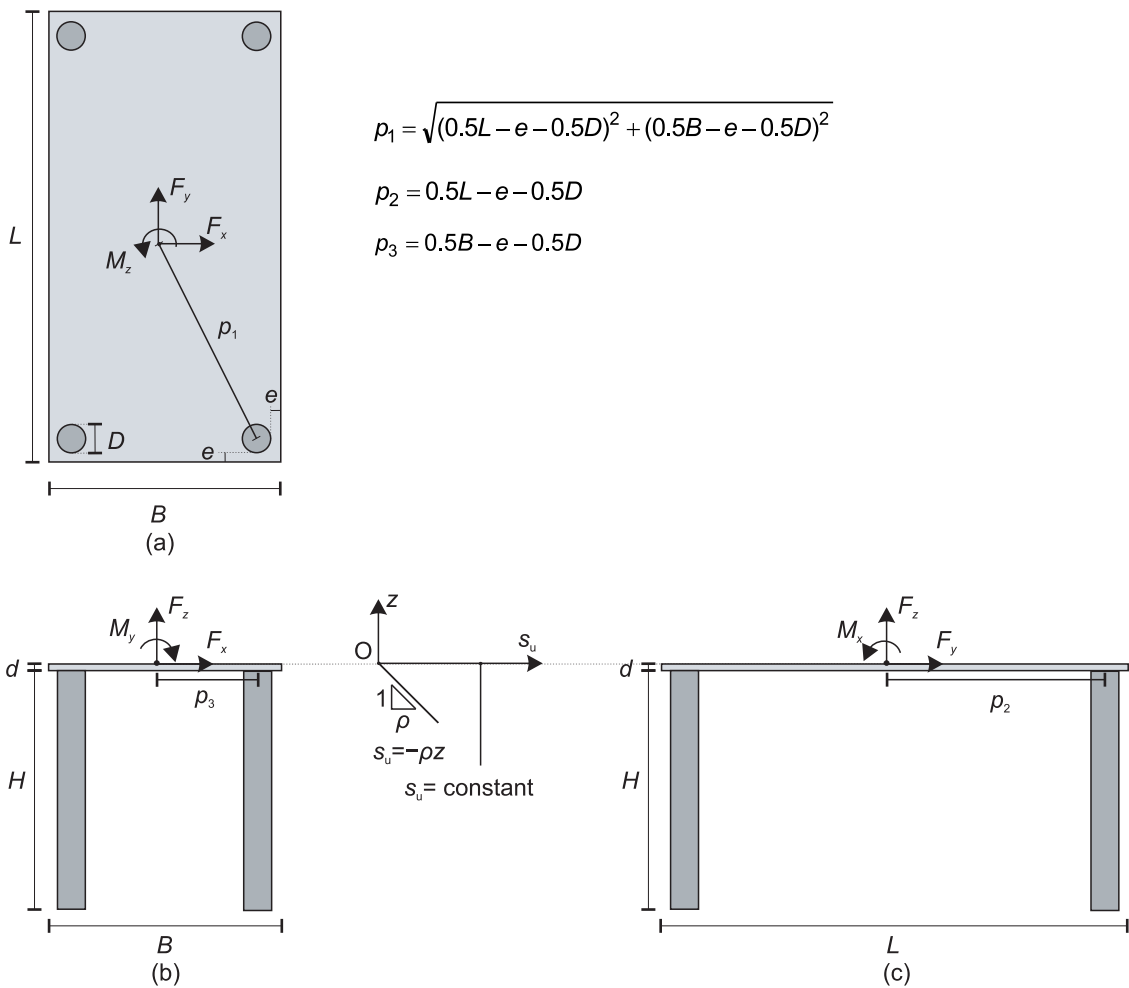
Notation used for hybrid foundation analysis showing soil strength profiles and eccentricities of pile heads from the mudmat centre: (a) plan view; (b) front elevation view; (c) side elevation view
